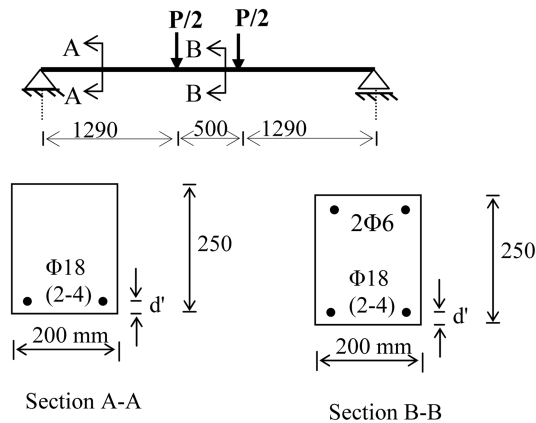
The simply supported steel fiber high strength concrete beams subjected to two point loads
